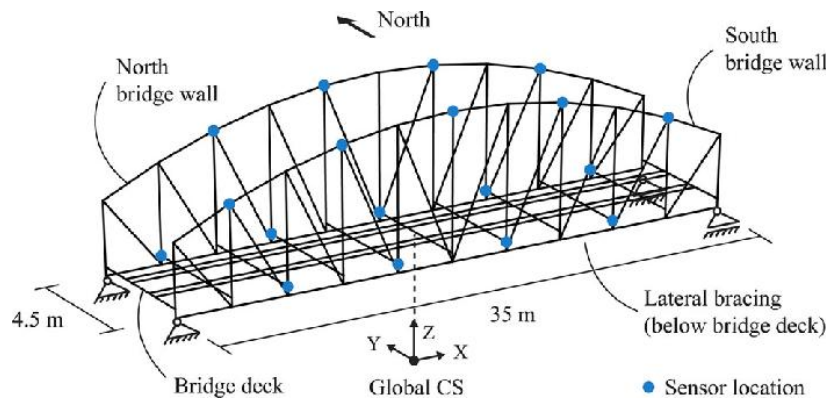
Layout of sensor placement on a bridge deck for vibration monitoring
